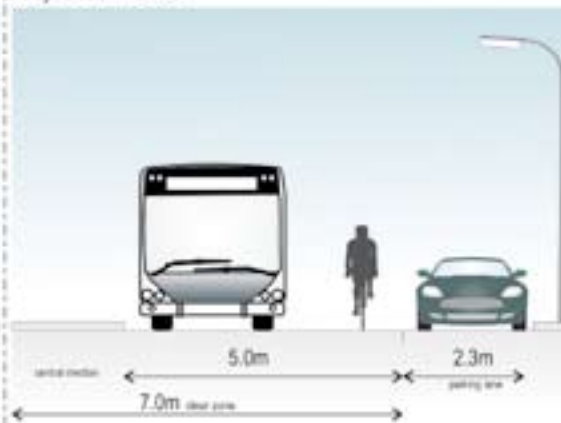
Typical local road cross-sections for bus routes (undivided road)
